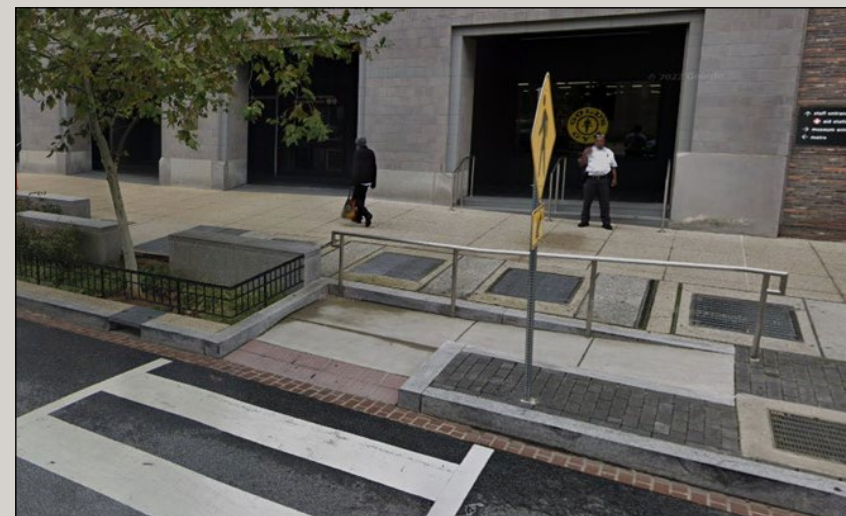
Green Infrastructure planter with universally accessible mid-block circulation ramp connecting the curb to the sidewalk along D Street, SW between 3rd and 4th Streets.
